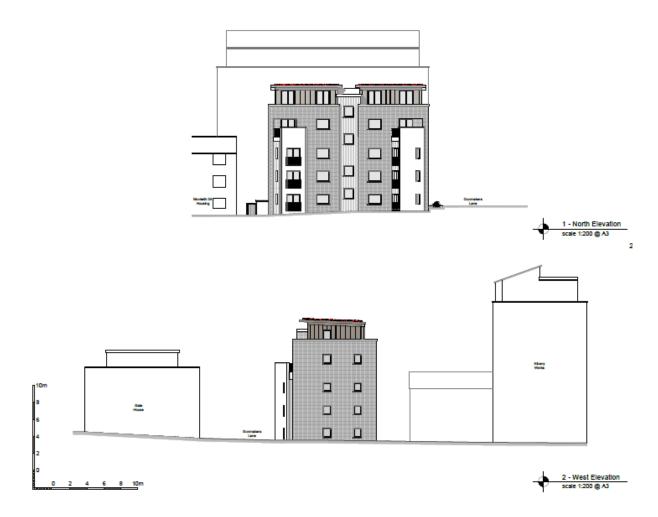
Contextual elevations showing the proposals against Albany Works to the south and Gate House to the north
